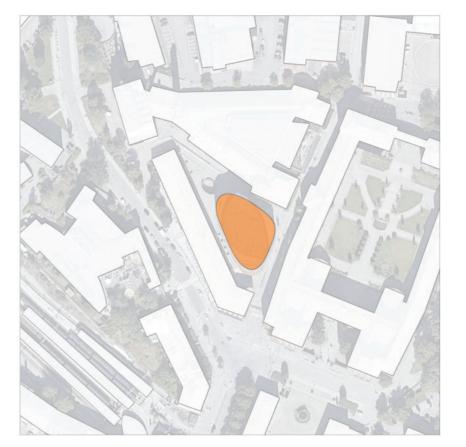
Site plan, KTH School of Architecture. Altered by authors.
